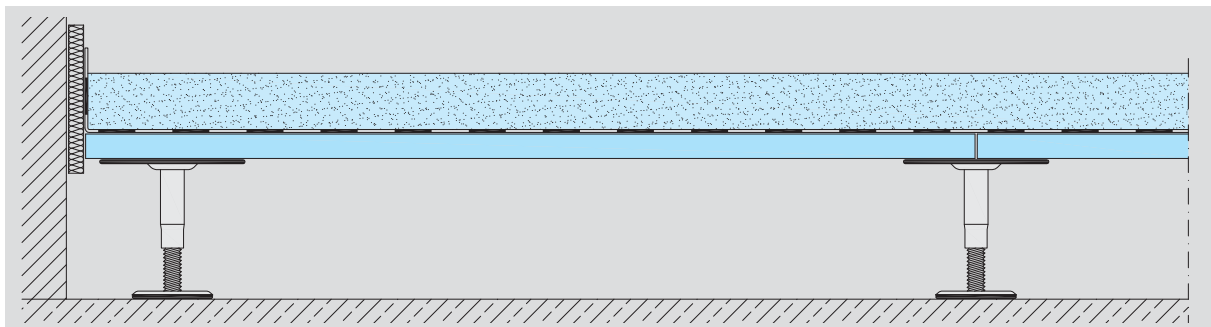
Hollow floor with hollow body casing made of gypsum boards and wearing layer made of flowing screed /Knauf Gips KG/
